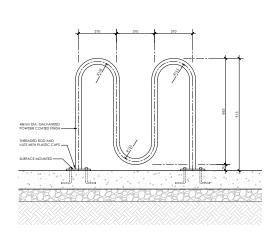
TYPICAL BICYCLE RACK DETAIL
